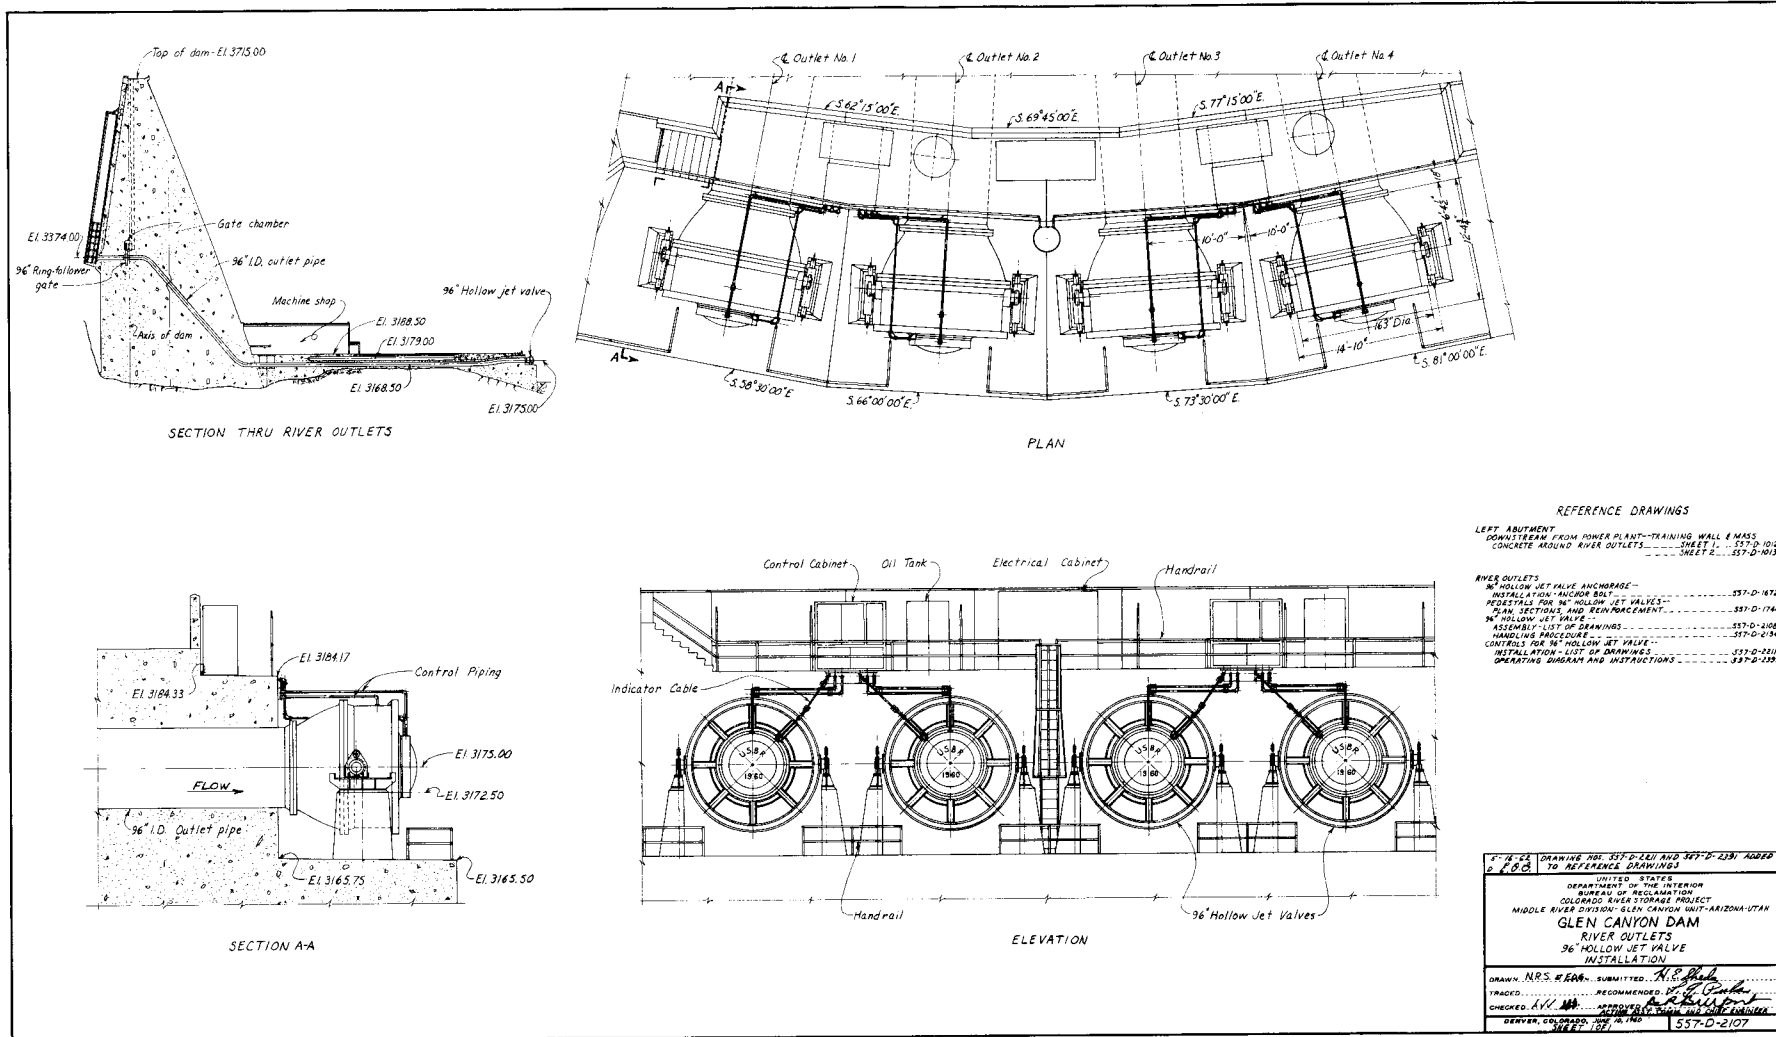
River outlets 96-inch hollow-jet valve—Installation.
